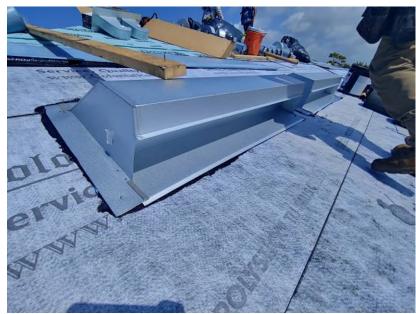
Second layer of underlayment installation was in progress on building 7850.
